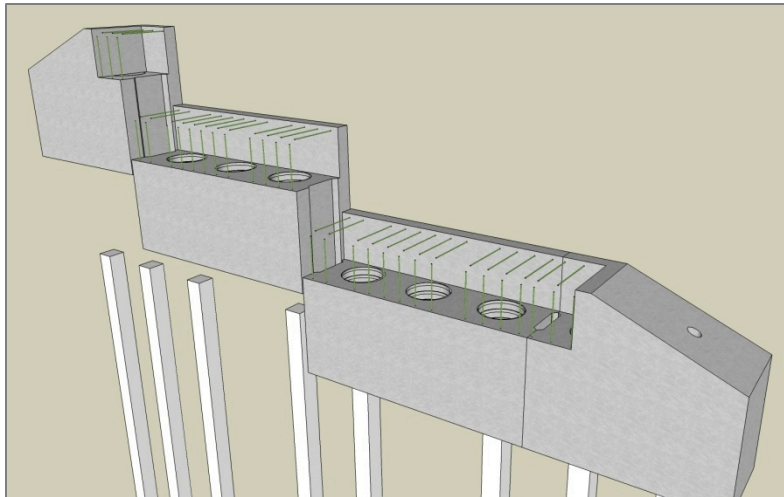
Precast Integral Abutment (Source: Utah DOT).
